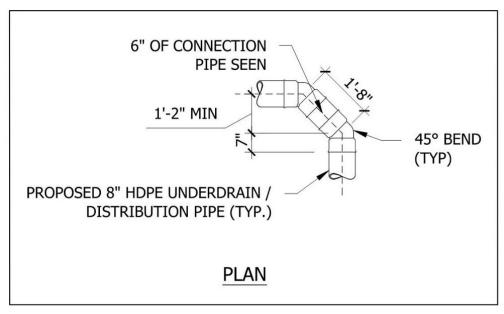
Typical 90° degree horizontal bend - 8" HDPE pipe
